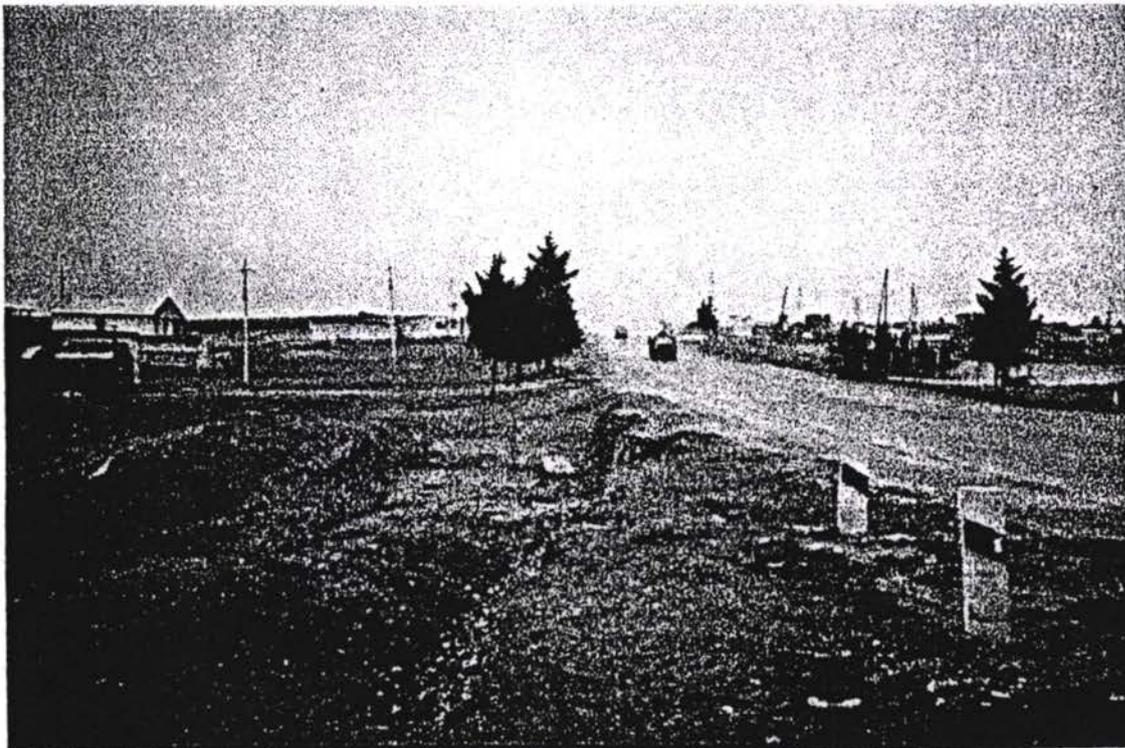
Example of possible dangerous dig and erosion at the road embankment
